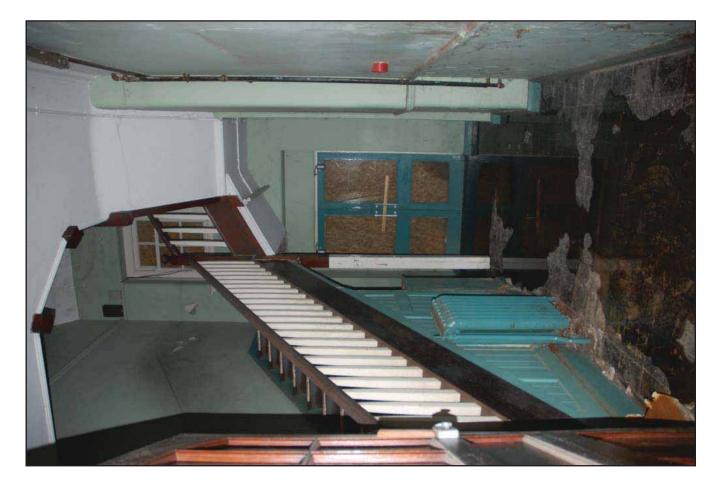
School Bank Road north building room F02 entrance and east elevation detail
